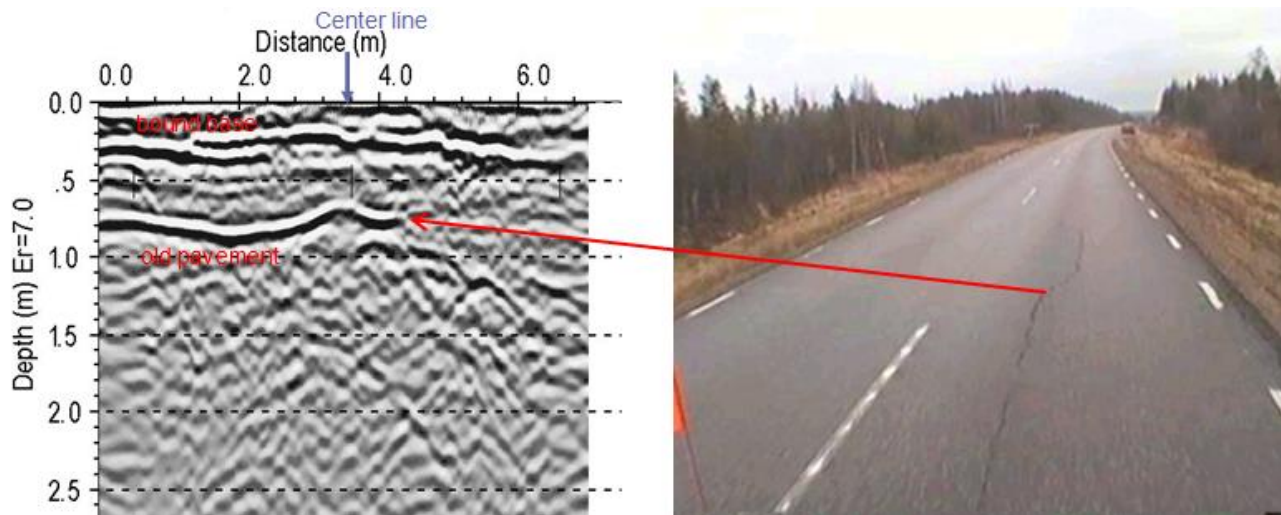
8. Old bituminous pavement layer inside the road structure on Salmi road in 2000.
